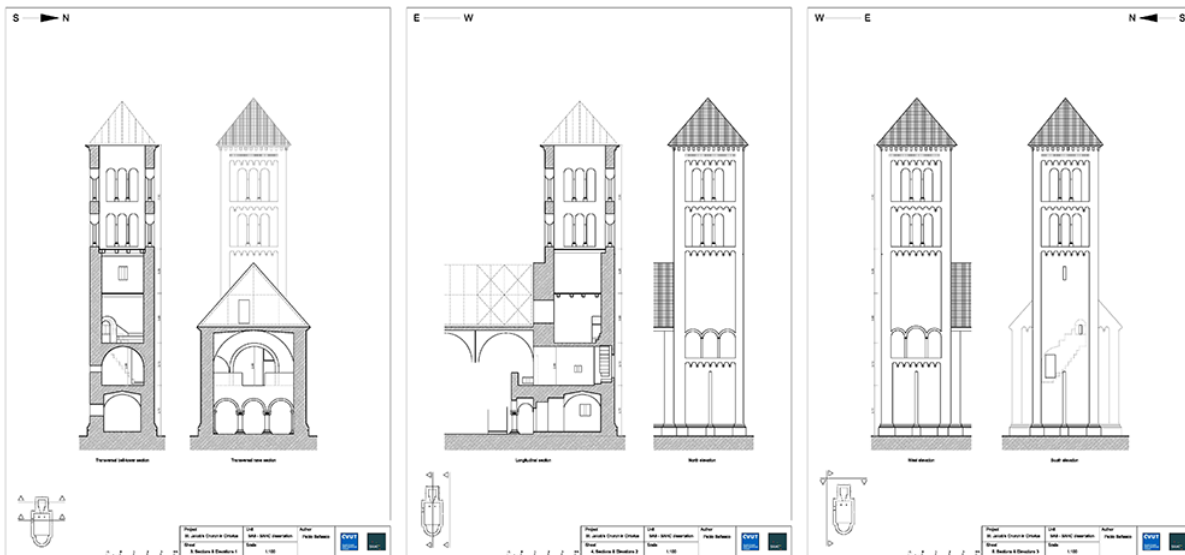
Sections & Elevations. Pablo Bañasco, 2018.
